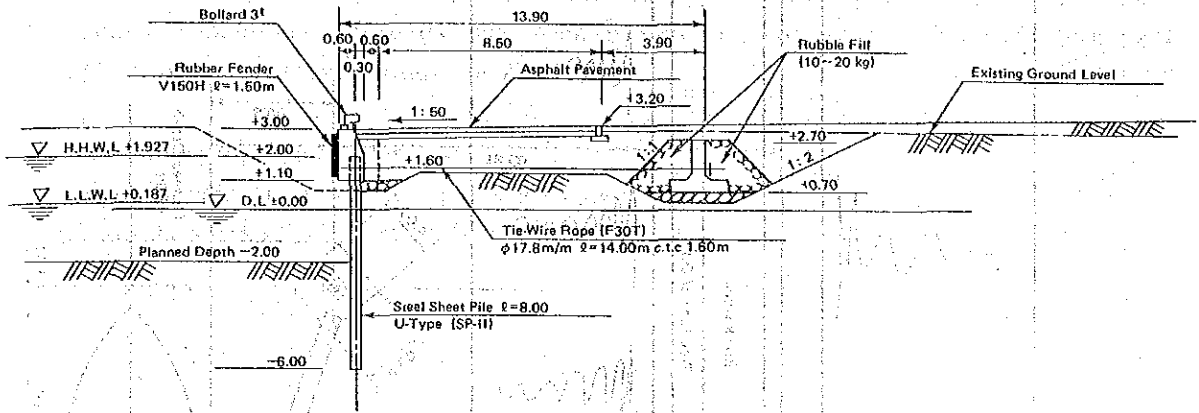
Standard Cross Section of -3.0m Quay (Steel Sheet Pile Type)
